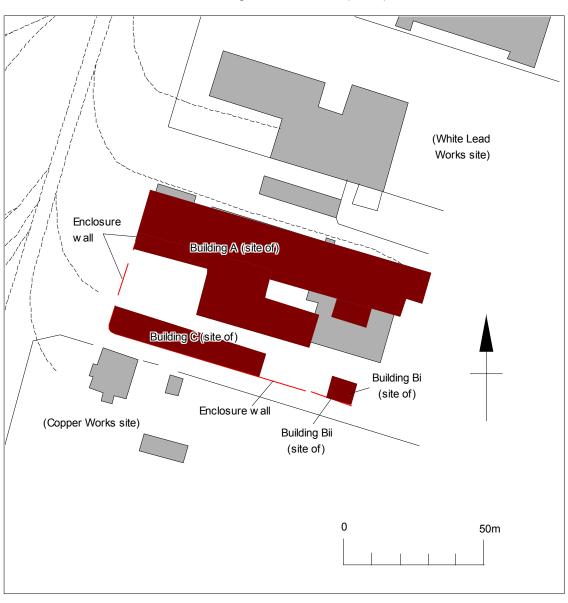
Plan of Lead and Silver Works area showing modern buildings and buildings shown in 1907 (in red)
